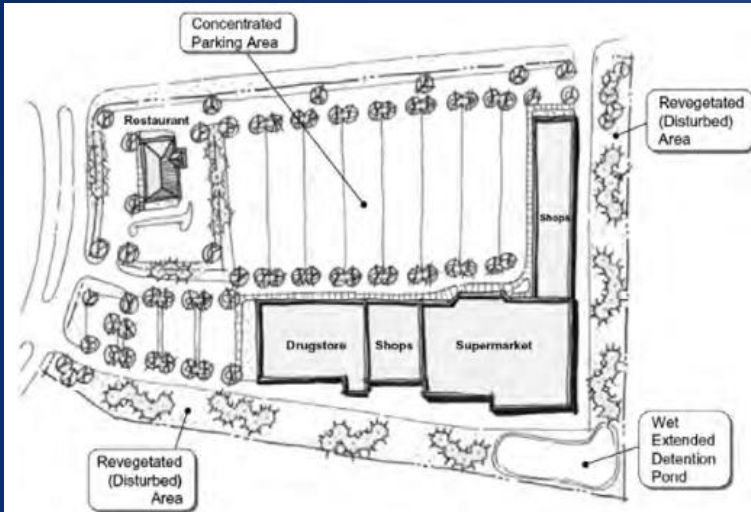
Conventional Parking Lot Layout (RI DEM, 2011)
